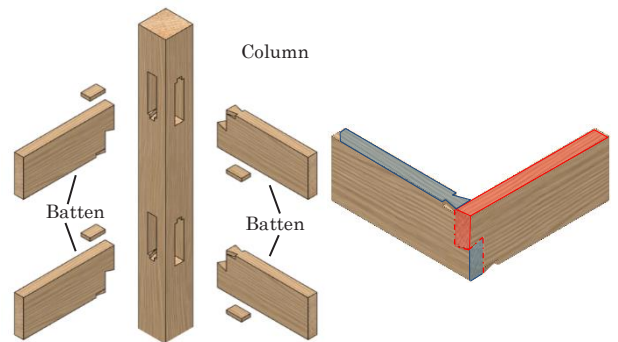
Details of Nuki joint (orthogonal layout) ^{注5)}
